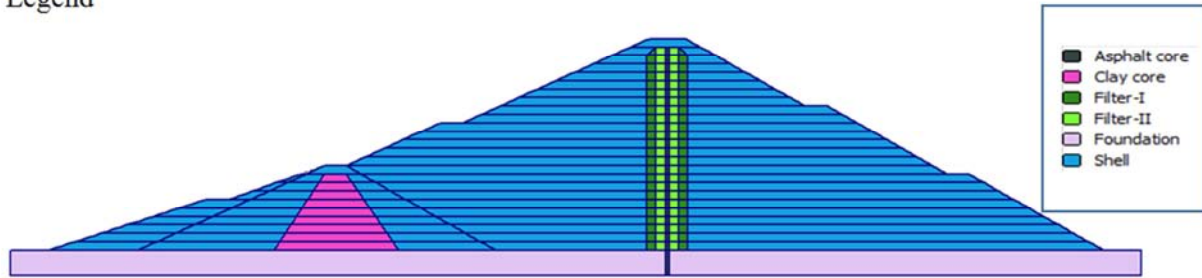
Asphalt concrete core embankment dam with its materials (source: Plaxis Output).
